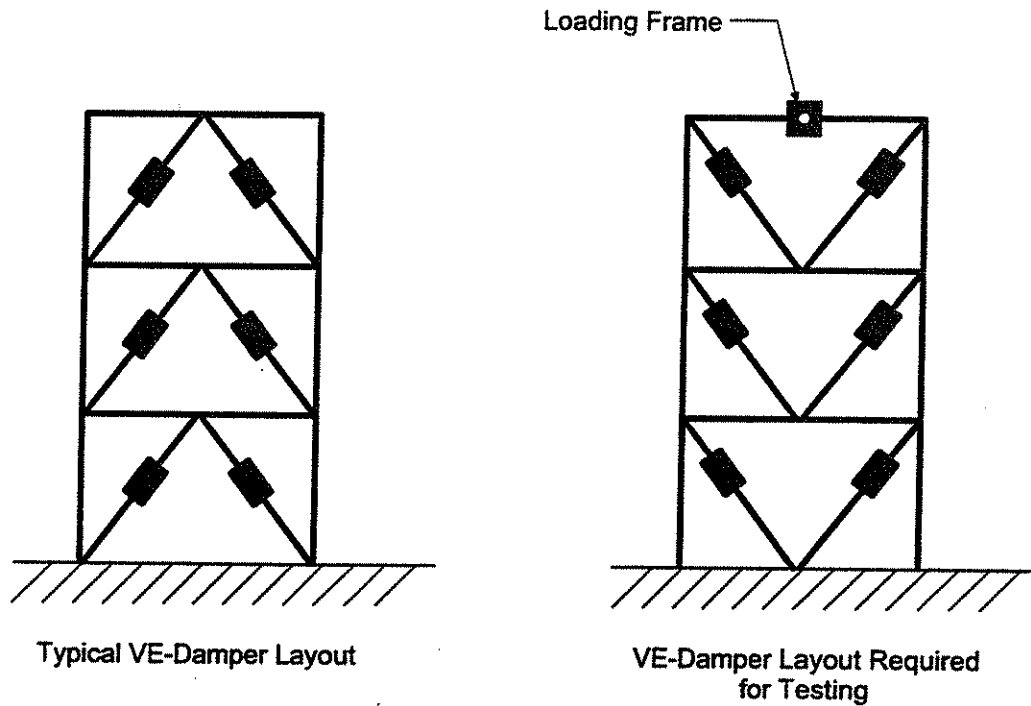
Typical VE-damper layout for actual structure and layout required for test specimen for loading frame attachment.
